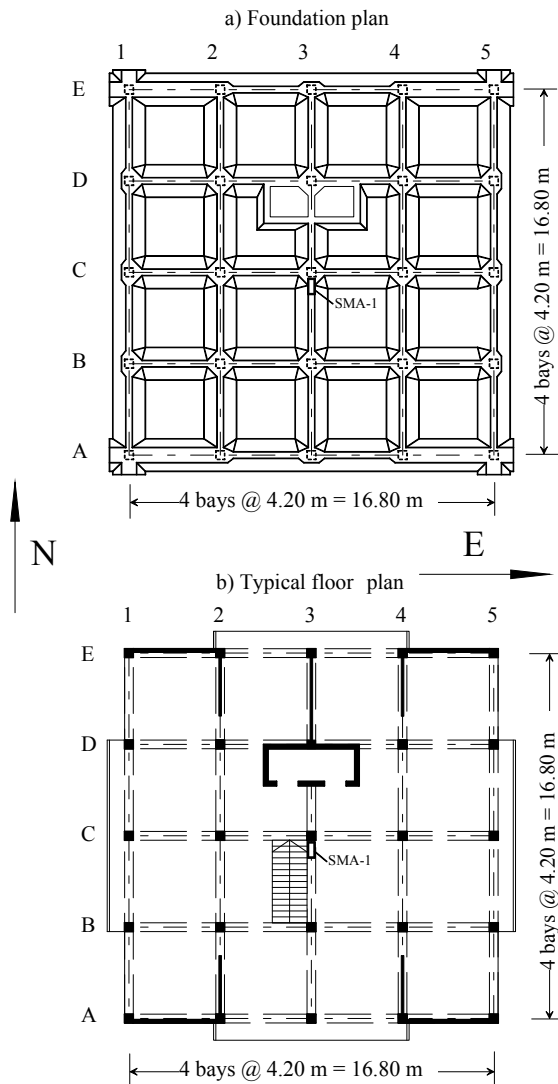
,b. Foundation plan (top), typical floor plan (bottom).
